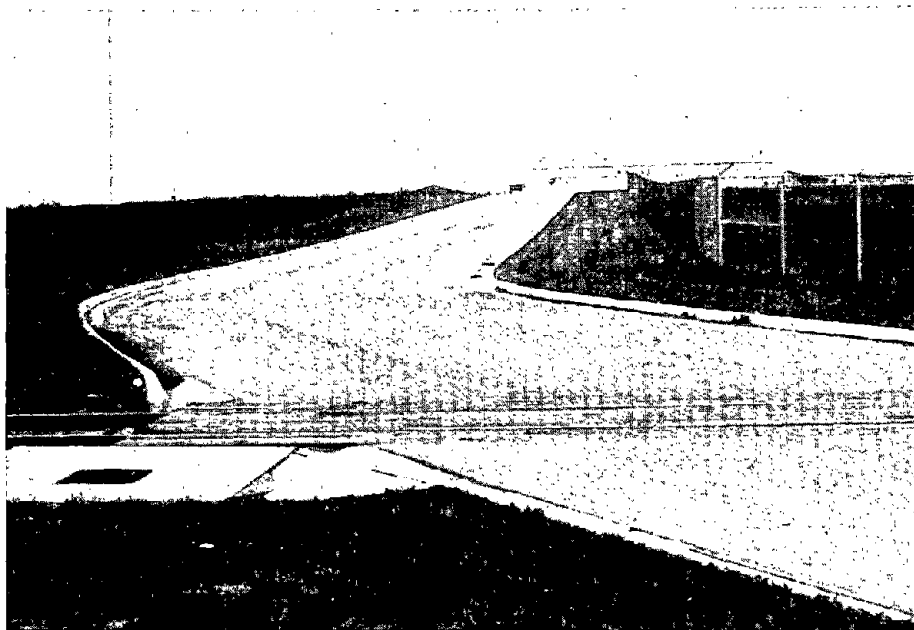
Completed industrial access road on fly ash-modified subgrade two years after construction.
